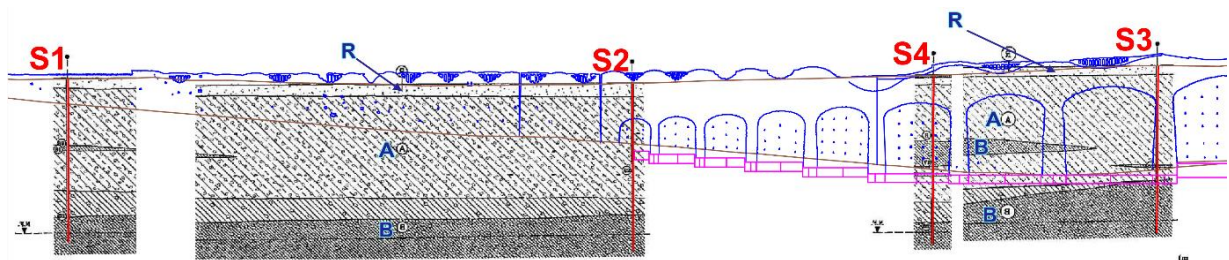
The approximate projection of geotechnical cross-sections on elevation drawing of the wall.
